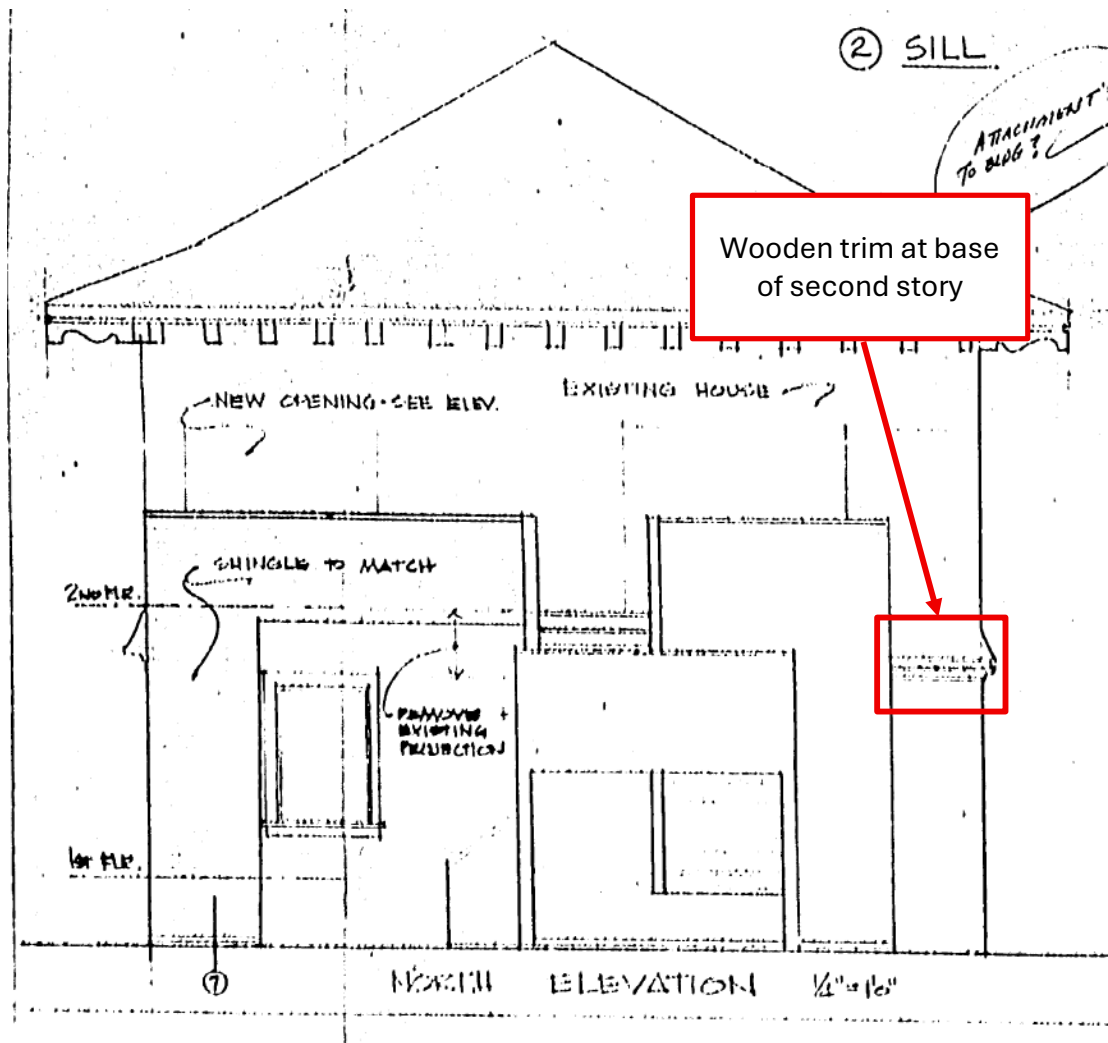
North elevation drawing showing the second story addition of a deck and exterior staircase (Microfiche files, dated around 1960s)
